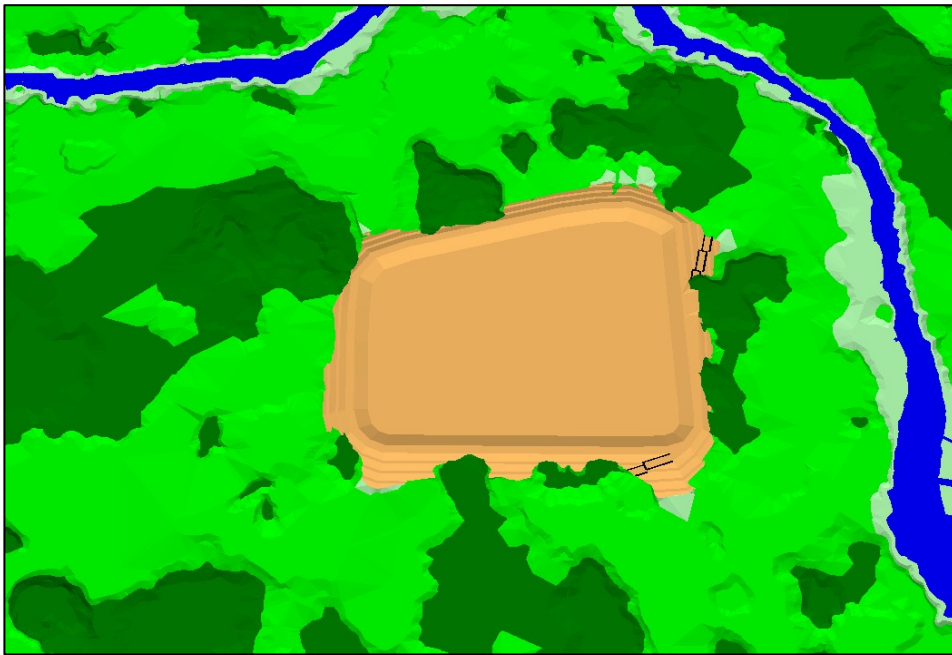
3D View Stage 1 of TSF at Jugan
